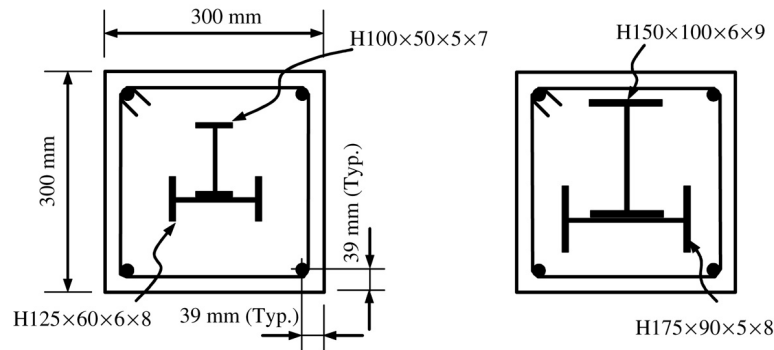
Cross sections of concrete encased steel composite columns with T-shaped steel sections [23].
